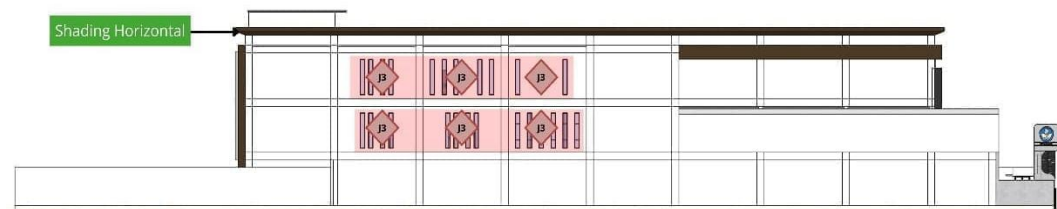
(c) Type of openings and shading on the west elevation (source: author, 2026)
